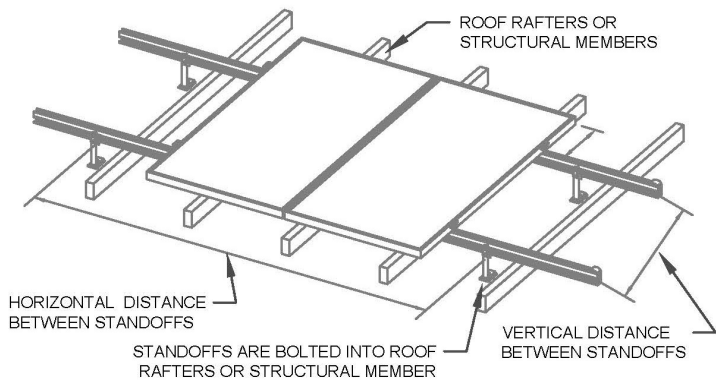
DETAIL ① STAGGERED ATTACHMENTS LAYOUT
